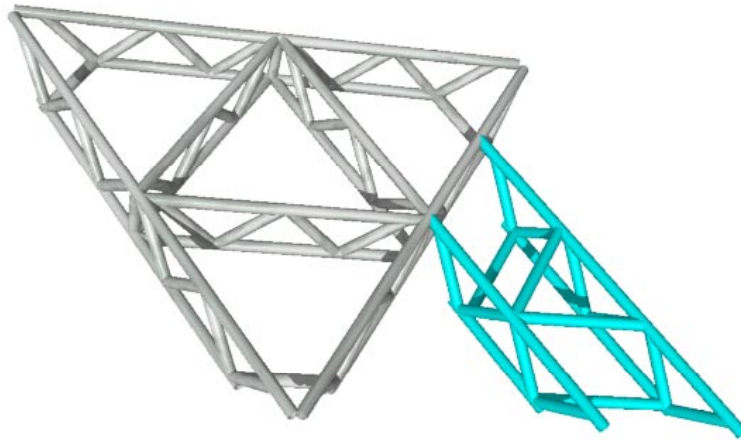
Triangular space frame design with bridging structure. The major triangular trusses (left of figure) form the foundation of the backup structure. They are about 20 m on a side. To avoid parallel trusses running side-by-side in adjacent space-frames, alternate space-frames in the overall structure are formed by using the bridging members (right of figure). This design meets backup structure requirements with a significant reduction in steel and cost.
